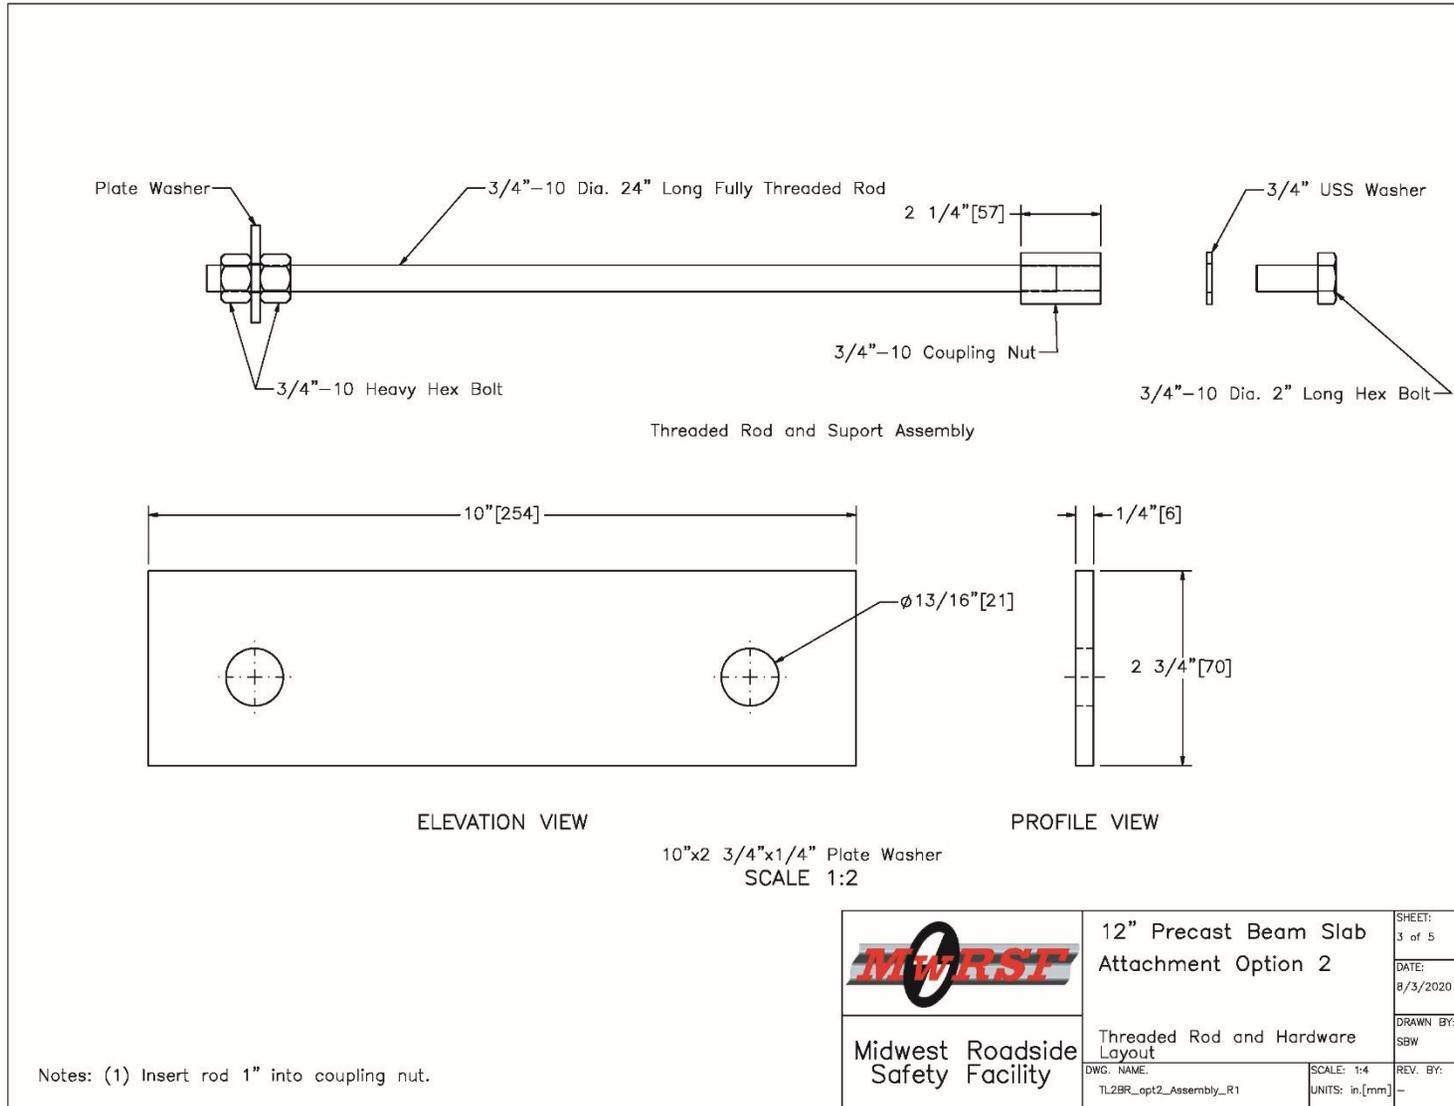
System Details, TL-2 Bridge Rail Attachment to 12-in. Deck, Option 2, Embedded Anchorage
